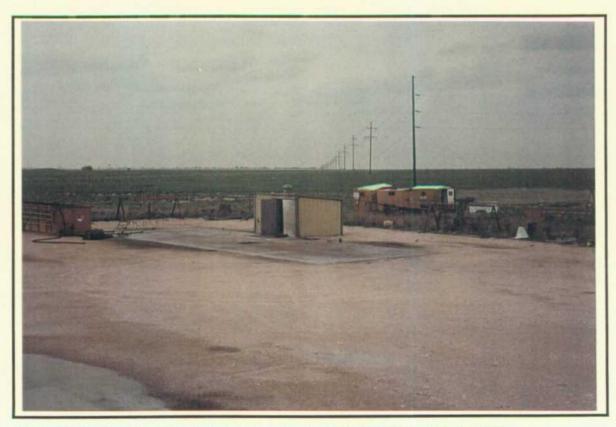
Northeast wash pad/seepage pit prior to restoration/assessment activities.
